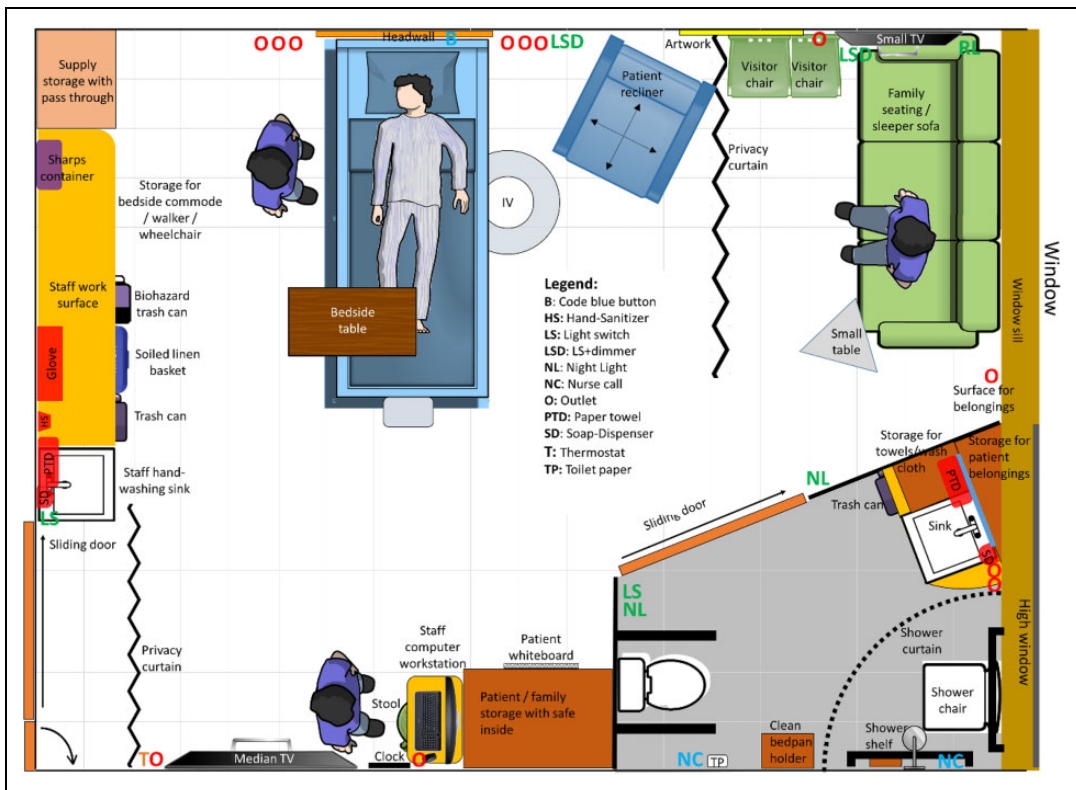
The hybrid design based on four room layouts where the bed was offset from the corner door with outboard bathroom.
